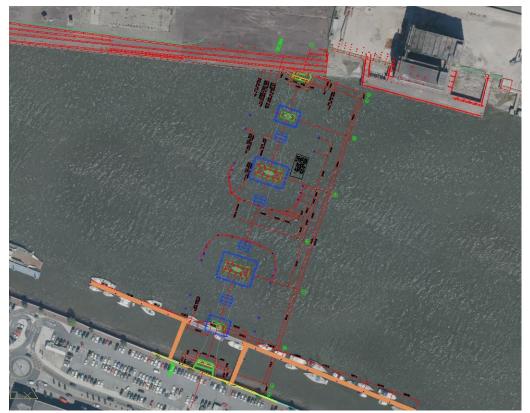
Proposed Bridge Crossing of Suir Estuary between North and South Quays in Waterford City
